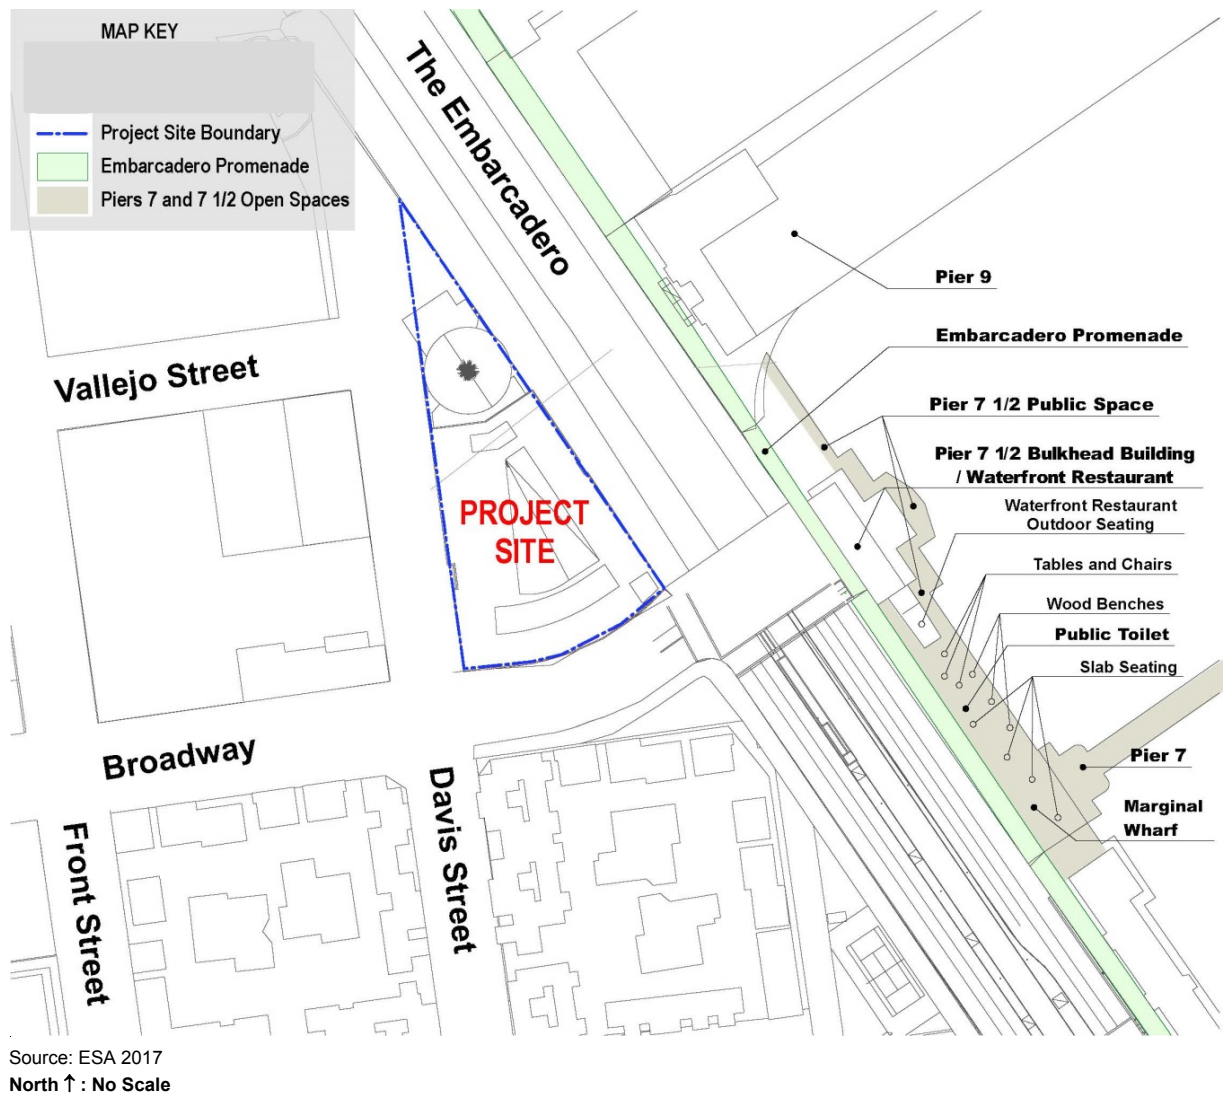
PROPOSED PROJECT WITH PROMENADE PIER STRUCTURES AND PUBLIC SPACE EVALUATED
